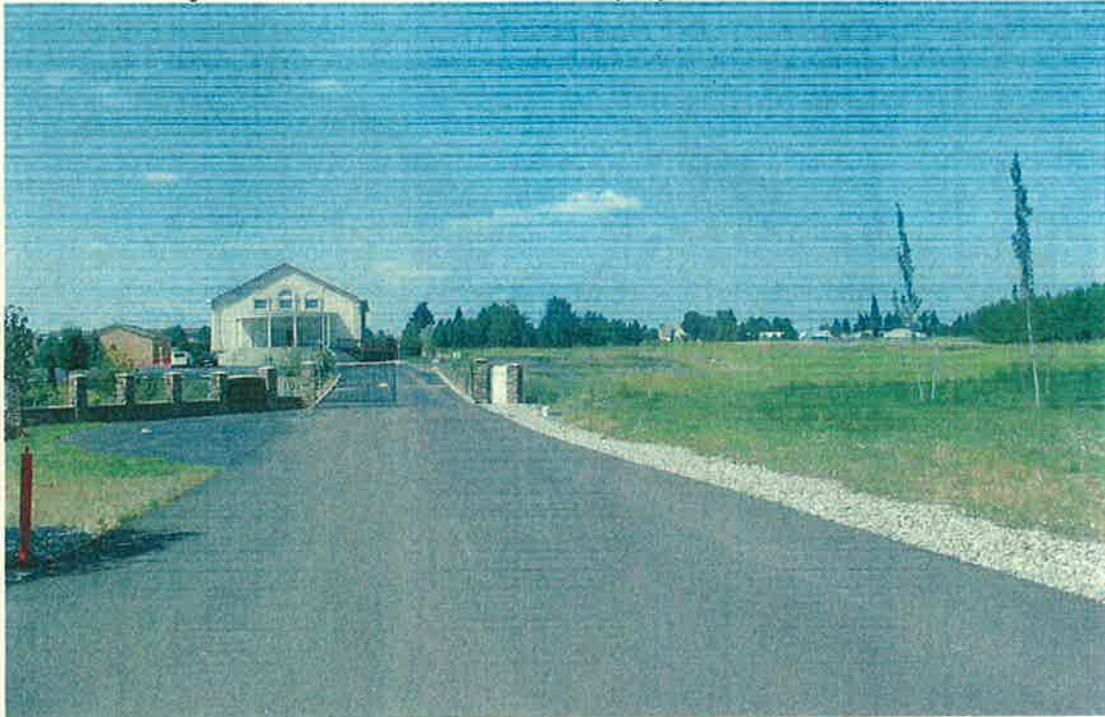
intersection of Strong Road & Nettleton Lane looking east
